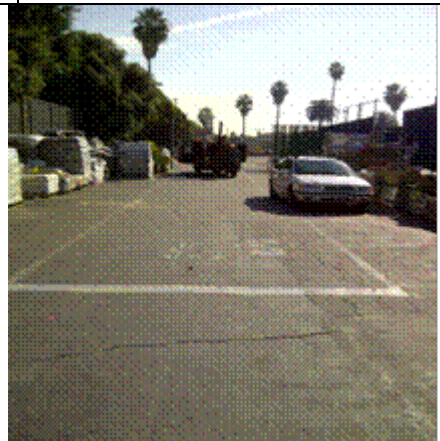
View south from the northeast corner of the Project, location of soil borings B5, B6, B7, and B8
